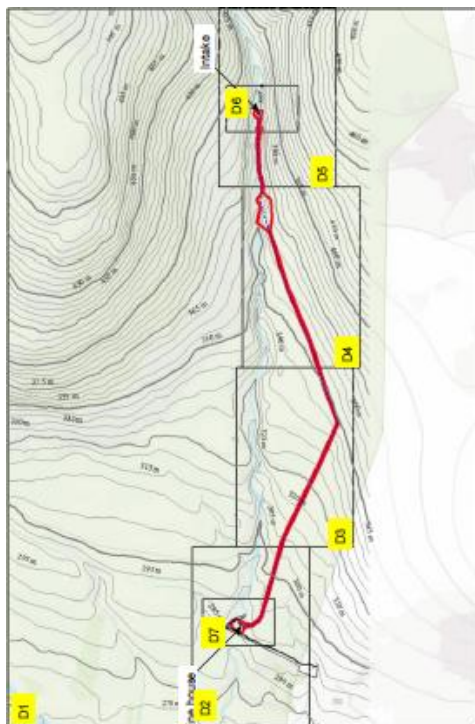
Extent of Hydro-Electric Scheme (Extract from Drawing No 12016D002-09 1 of 11 Location Plan – for information only)
